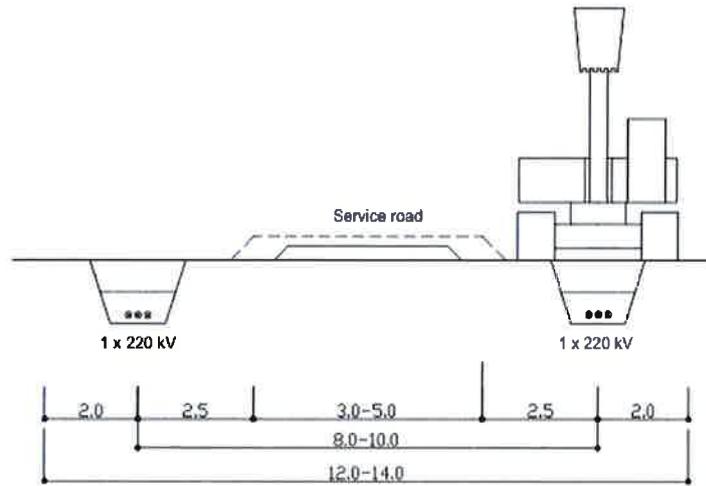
Minimum disturbance area for double set of 220 kV cables with service road between the two trenches. Excavated soil is removed from site.
